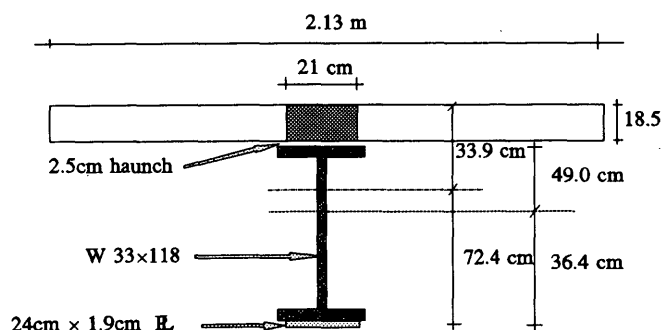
Design example of a composite concrete deck-steel stringer bridge ($b_{ef} = 2.1$ m, $L = 17.4$ m) (1 MPa = 145 psi).
